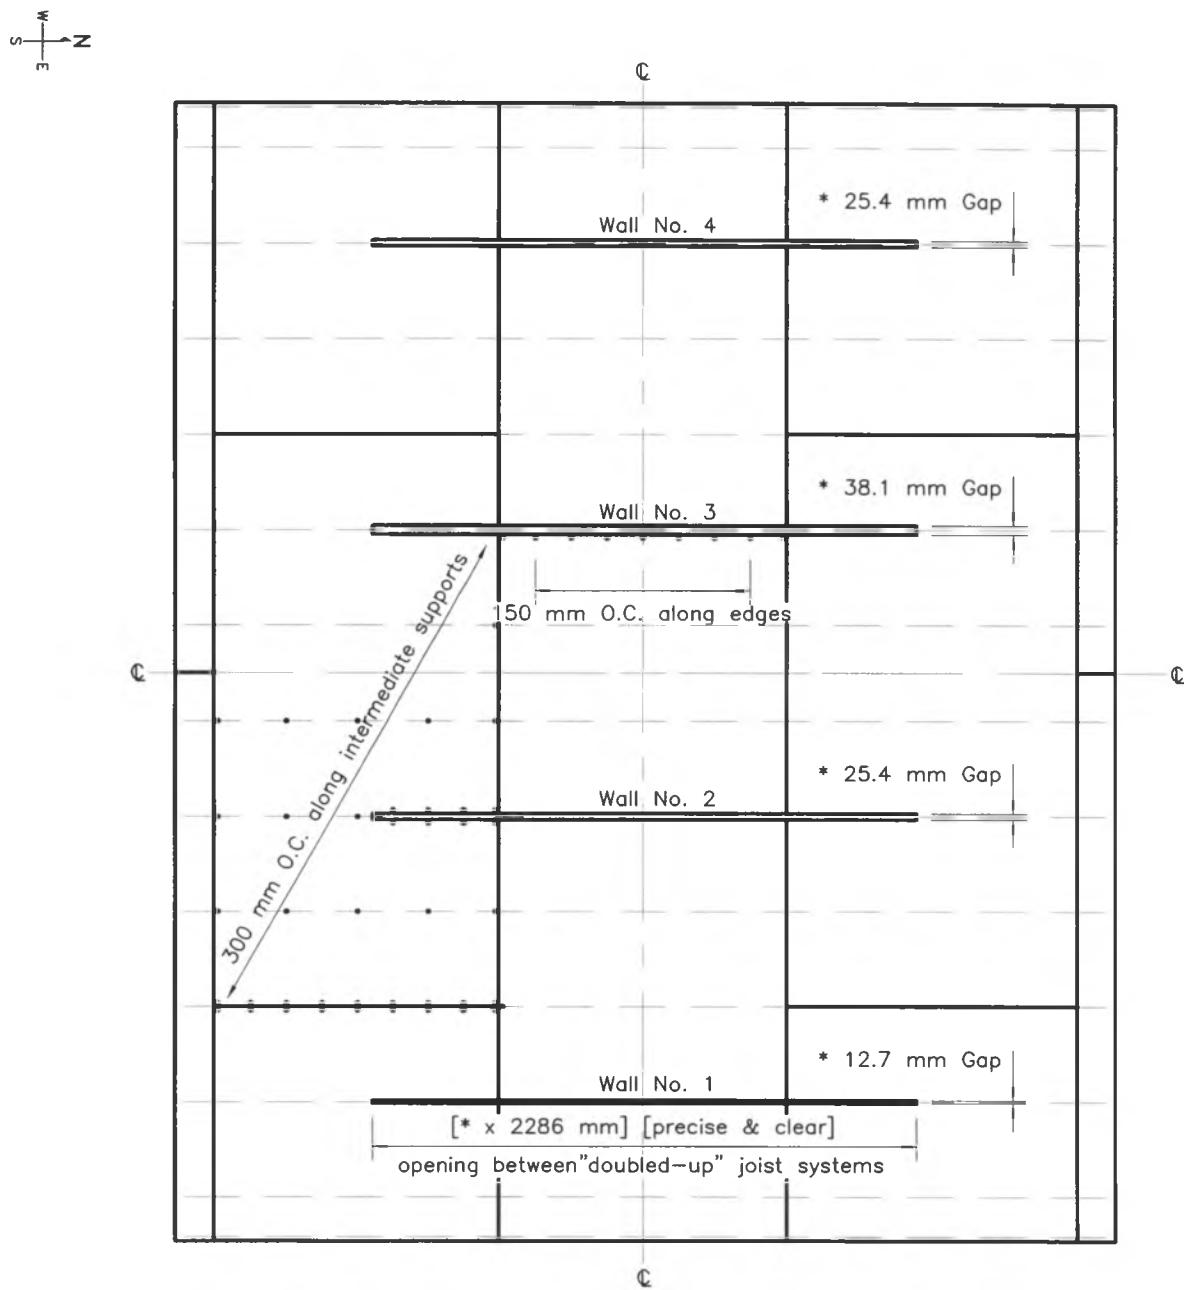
Assembly No. 2, Wall No. 2 Layout (Section F-F)
